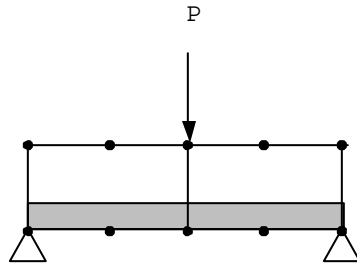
Illustration of 1-Span Bridge Chord, Rods are Frame Elements, 1-Point Load Beam Model
